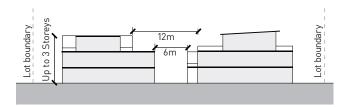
D.2-1: Minimum building separation controls for multi-dwelling housing development up to 3 storeys.
